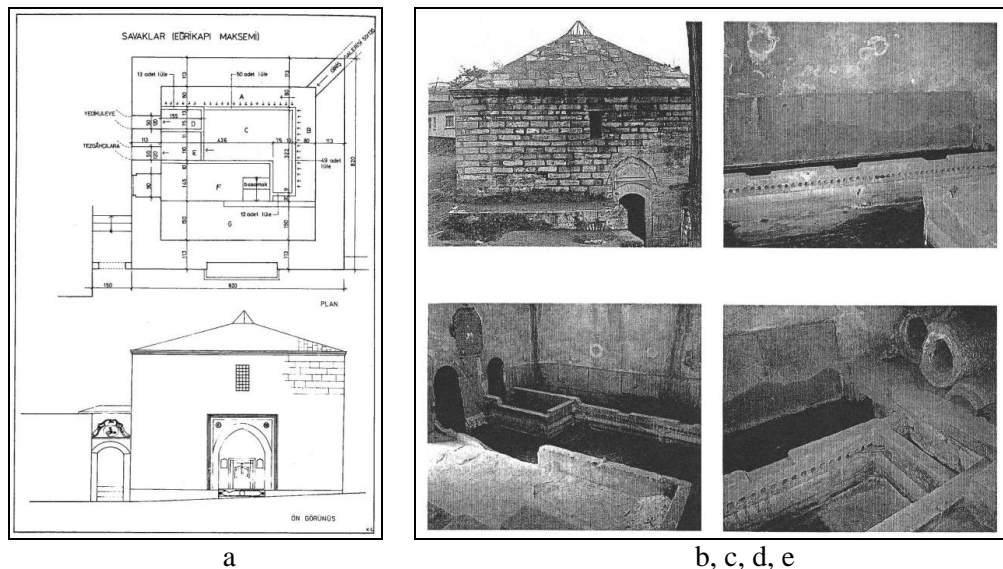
a) Plan and façade drawings, b) view from exterior c,d,e) views from interiors showing grouts and pools of Eğrikapı Maksem (Source: Çeçen 1988)
